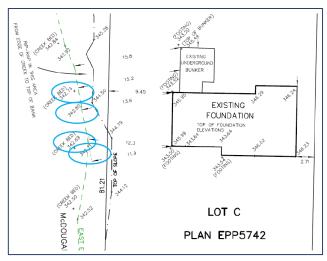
Existing Foundation Setback from McDougall Creek and Elevations
